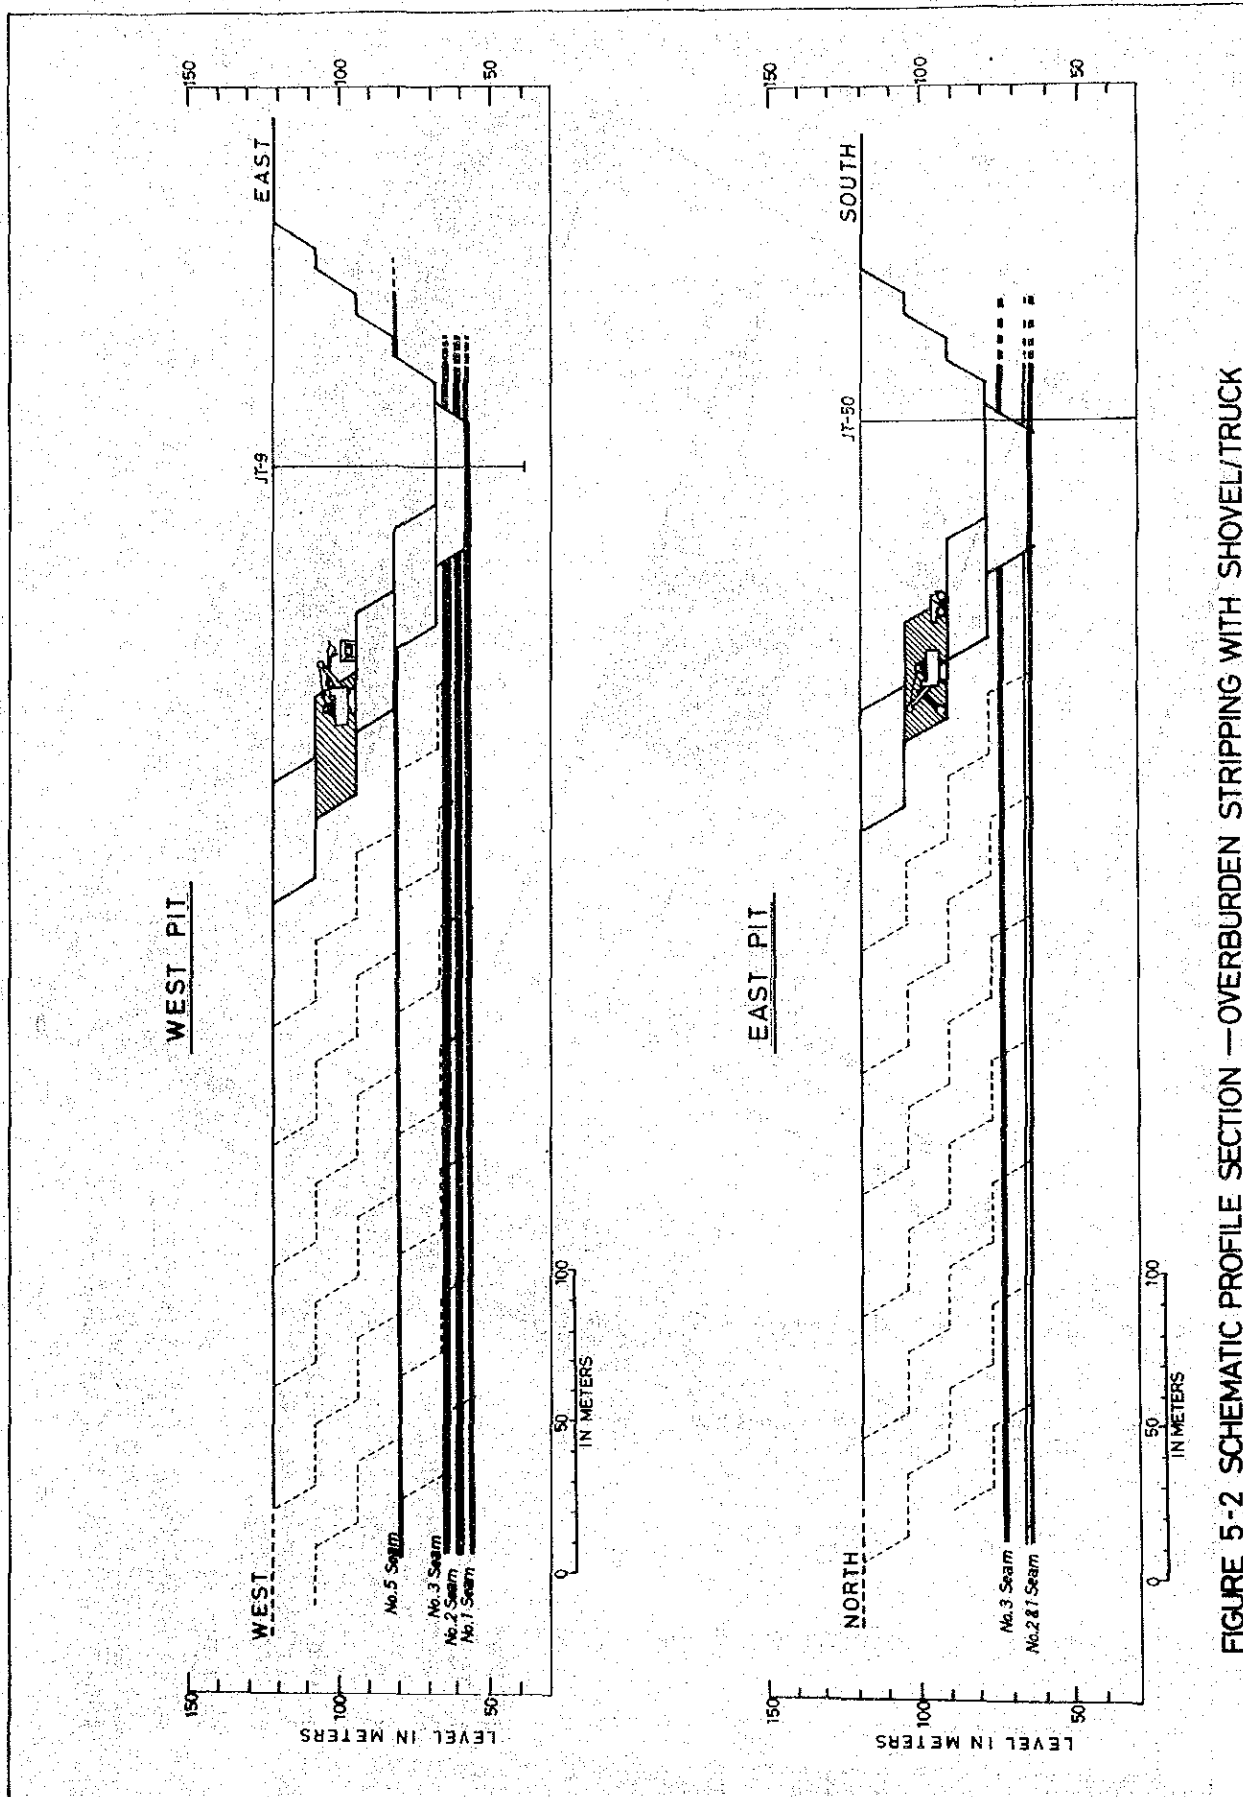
SCHEMATIC PROFILE SECTION — OVERBURDEN STRIPPING WITH SHOVEL/TRUCK
